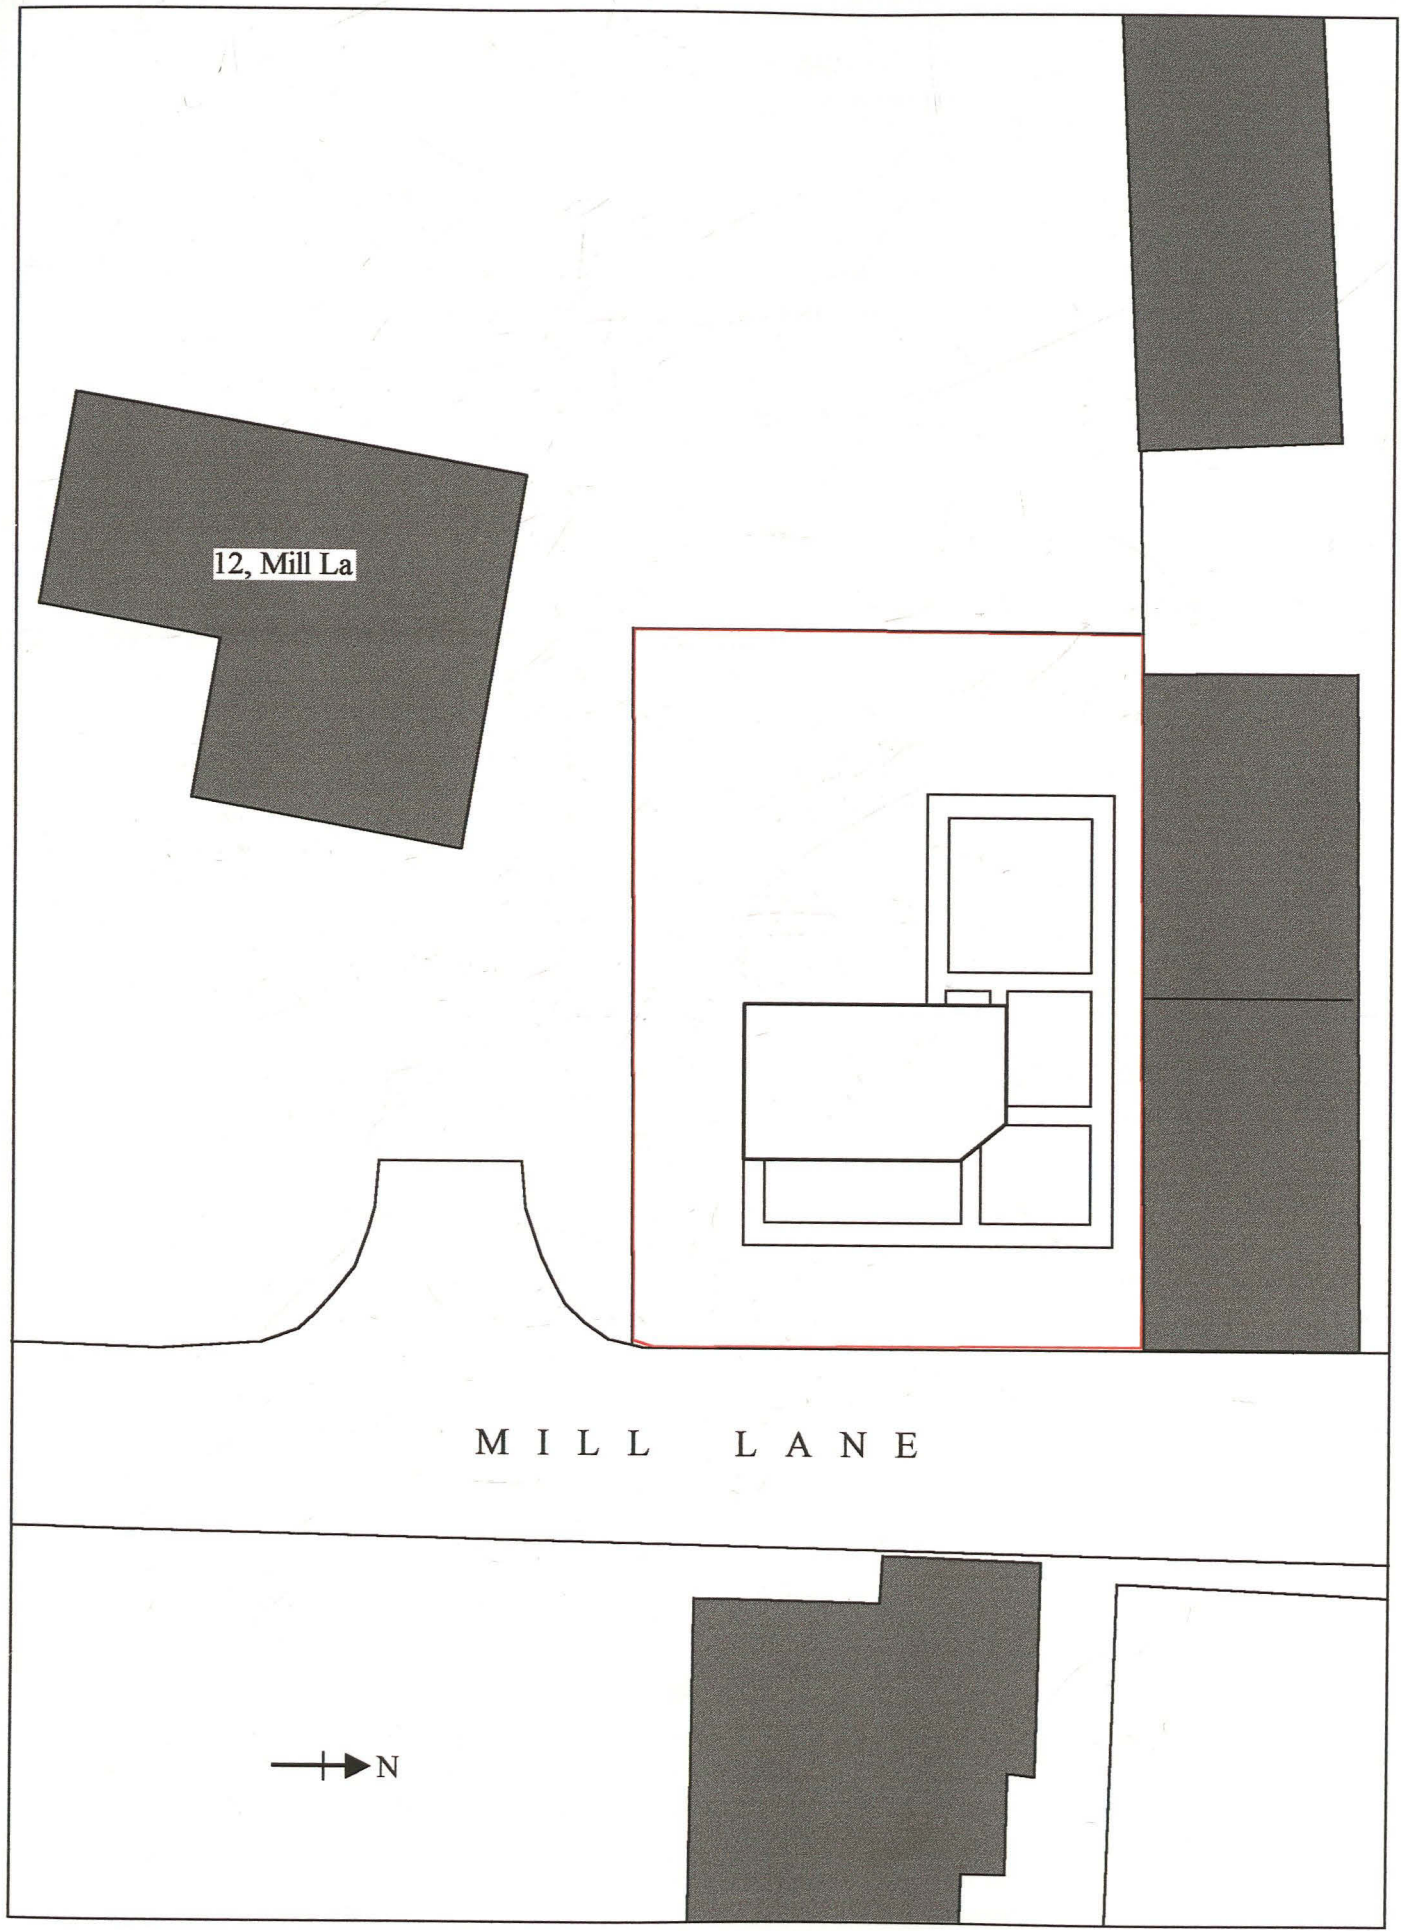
Location plan, showing the development plot (outlined in red). Scale 1:200
